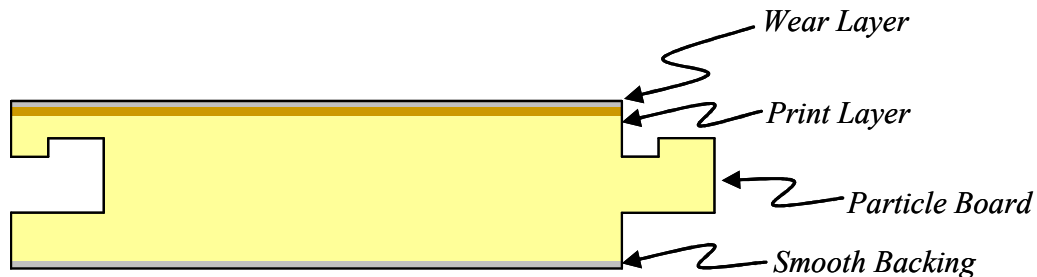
(c): Laminate floor plank construction consisting of a thin wear layer over a patterned print layer with a particle board core and a smooth backing layer.
